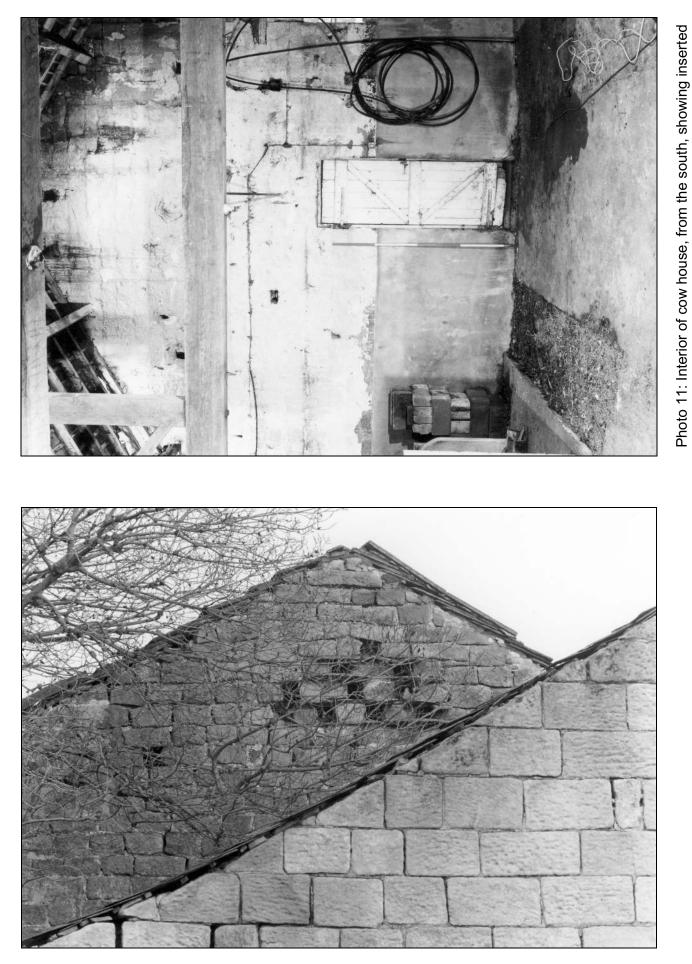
South gable of barn above cow house roof, showing openings to pigeon loft (film 5, frame 5)
